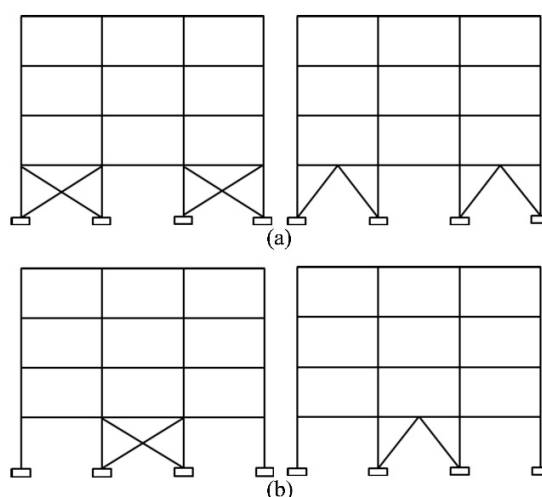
Retrofitting of existing structure with X and inverted-V bracing connections with: (a) Pattern-A and (b) Pattern-B, respectively.
